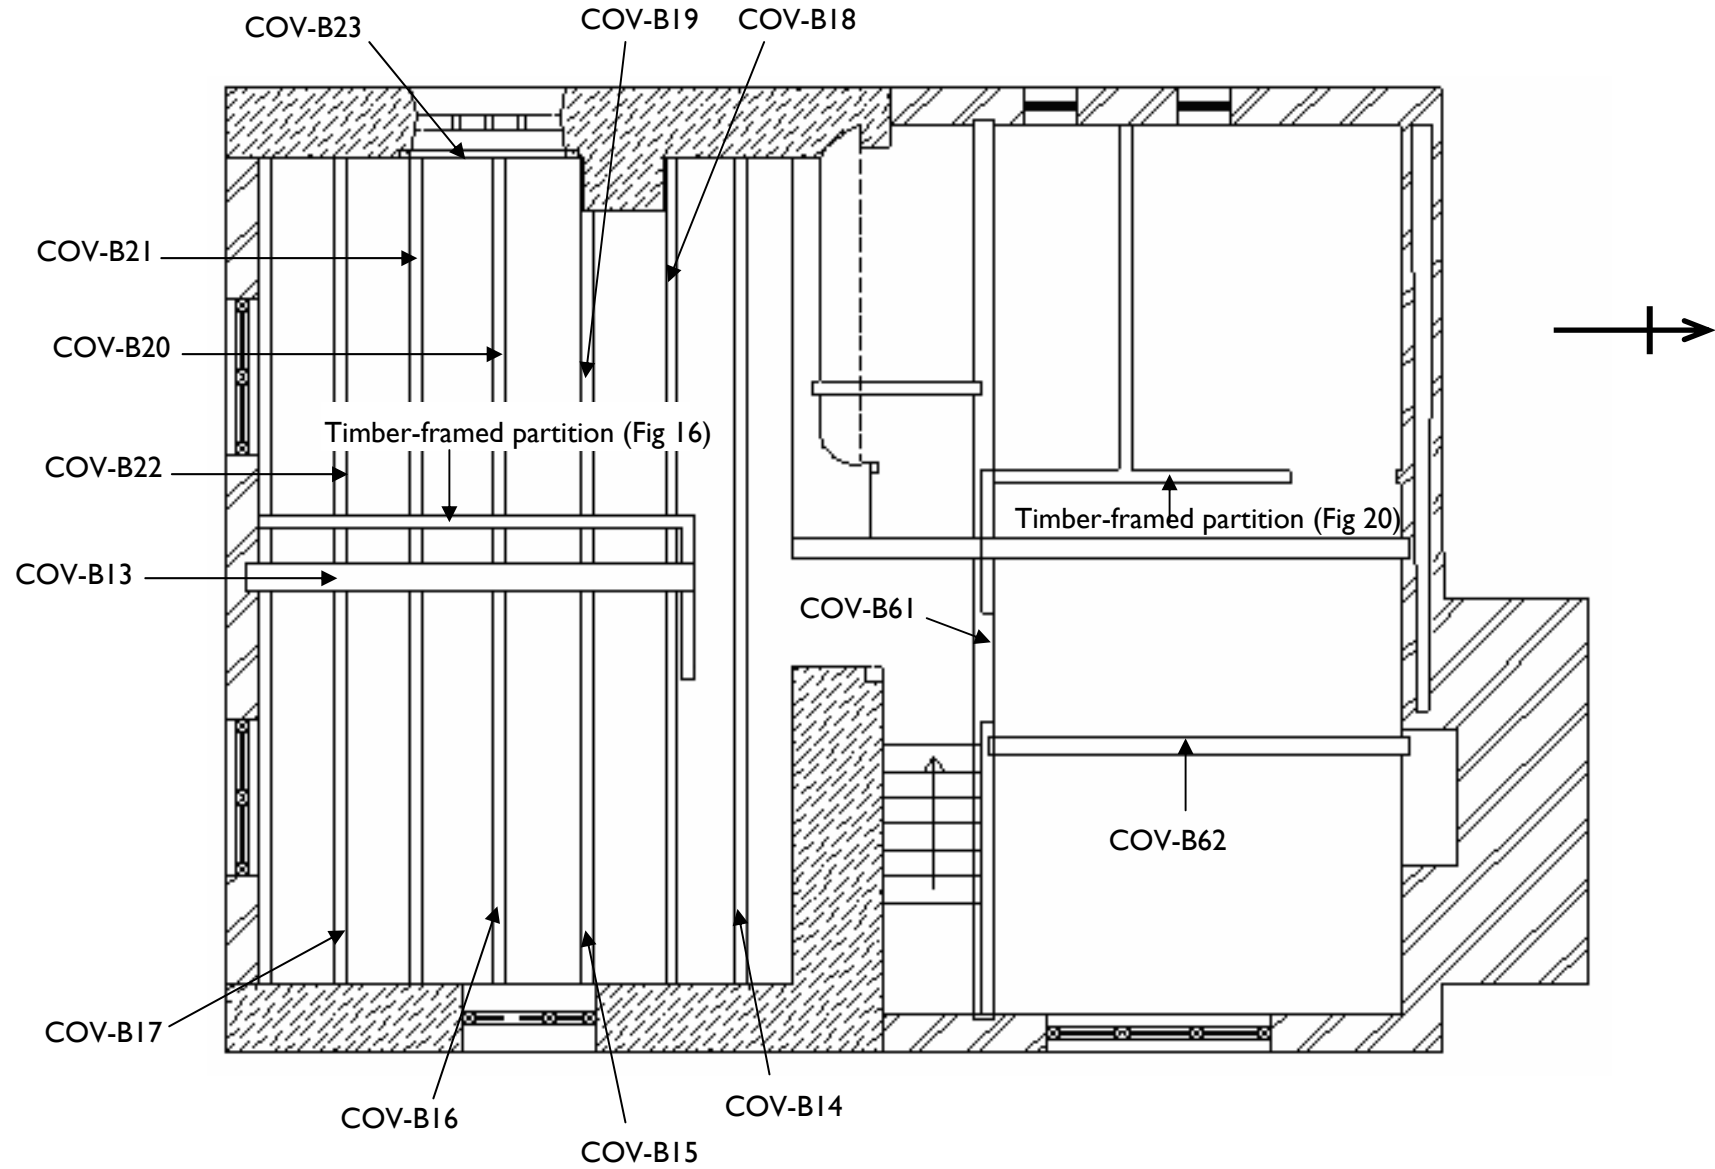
Cromwell Cottage; first-floor plan, showing the location of samples COV-B13–23, COV-B61, and COV-B62 (Frank W Haywood & Associates)
